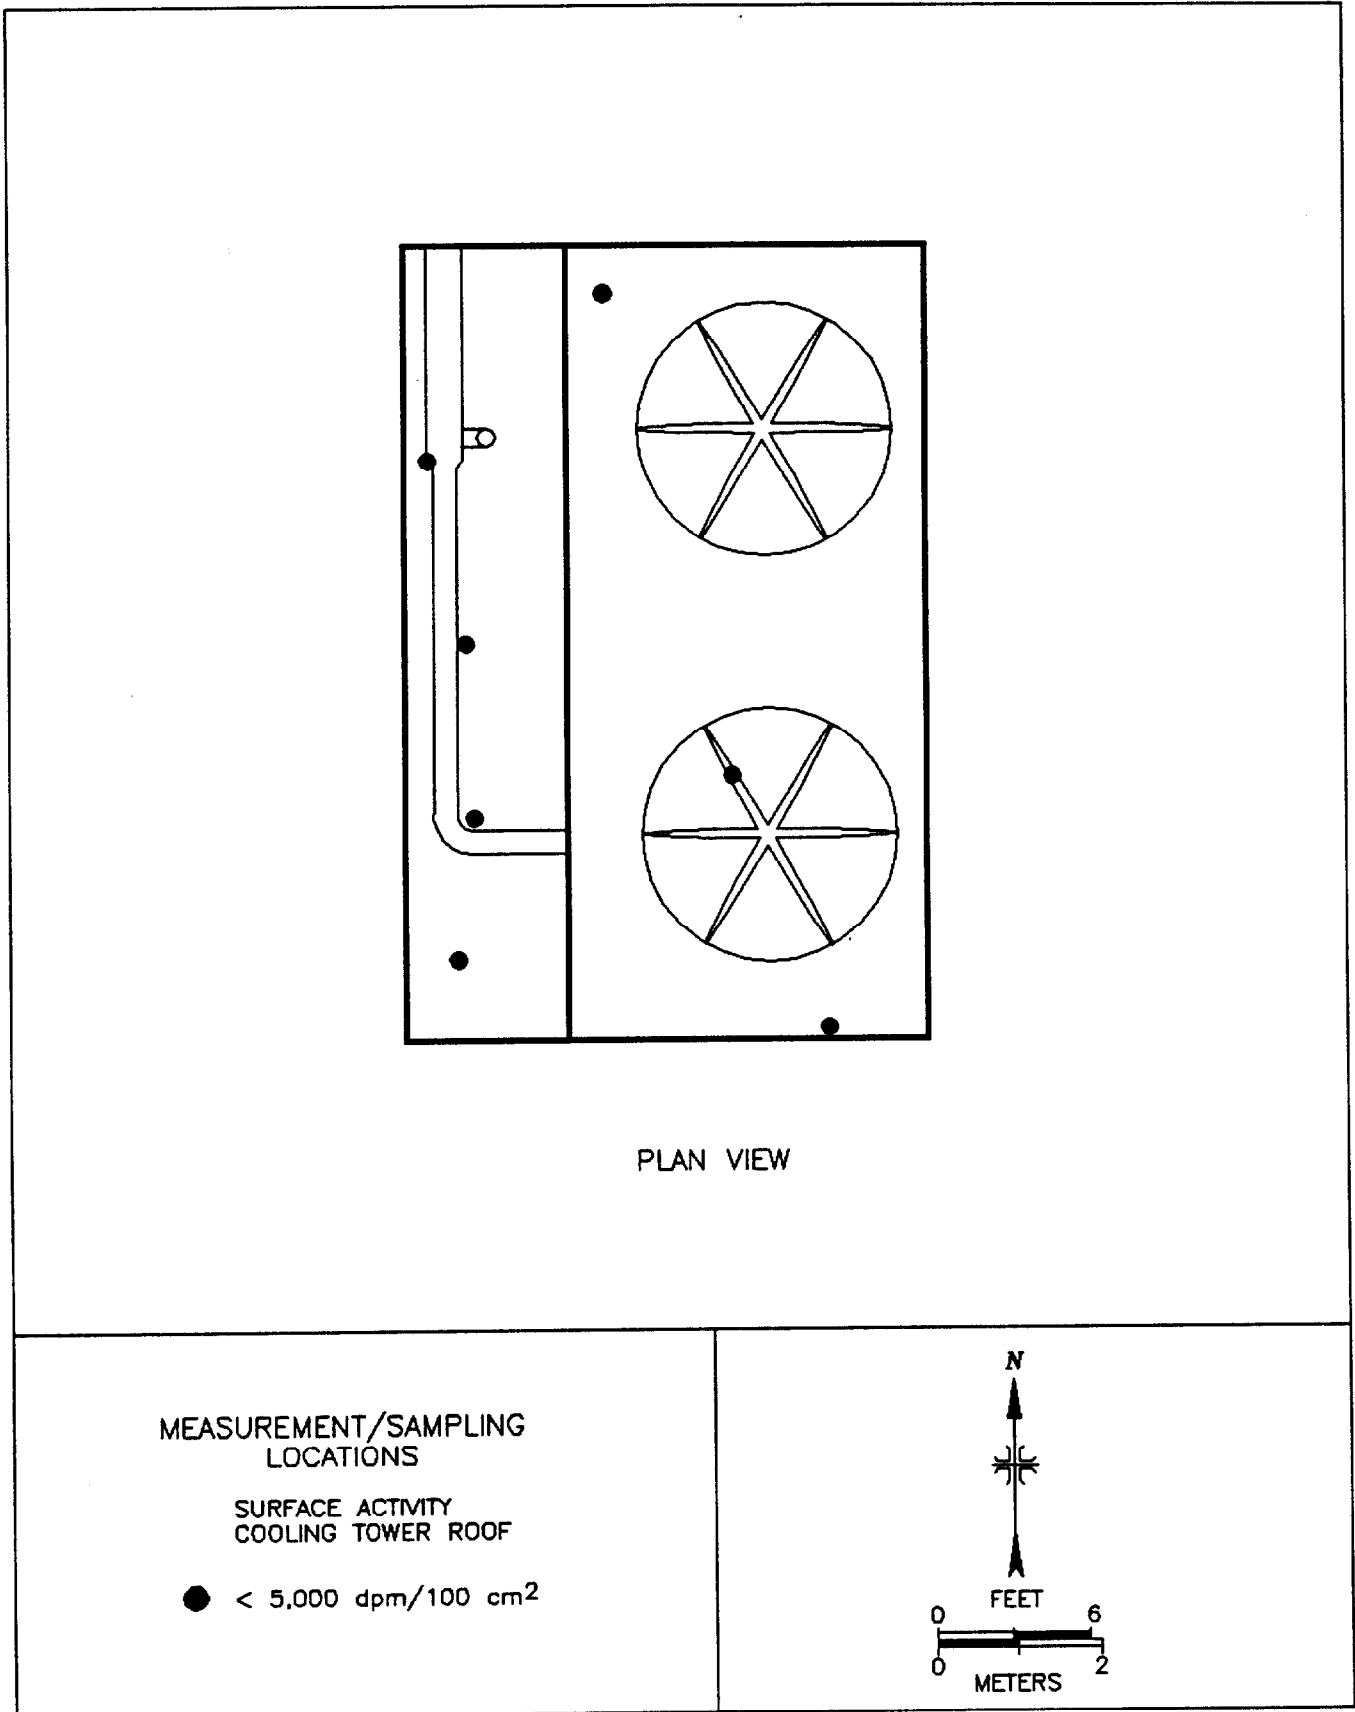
Cooling Tower – Measurement and Sampling Locations
